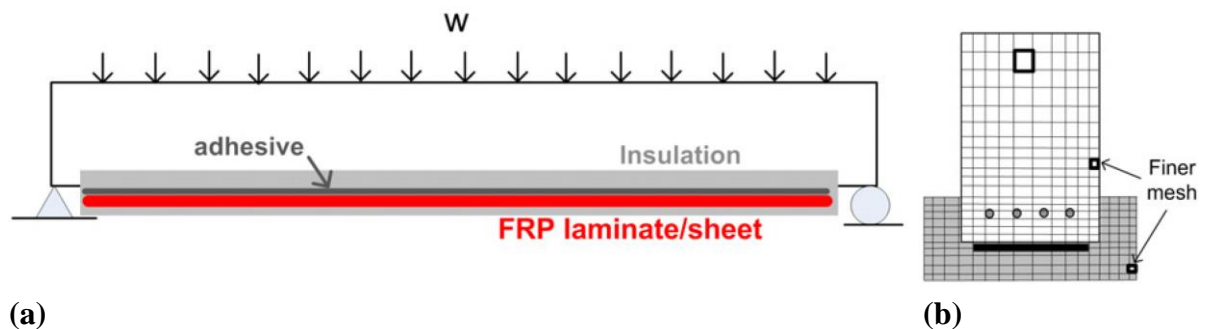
(a) schematic view of beams' longitudinal section; (b) element mesh discretization (adapted from Ahmed and Kodur [66])
